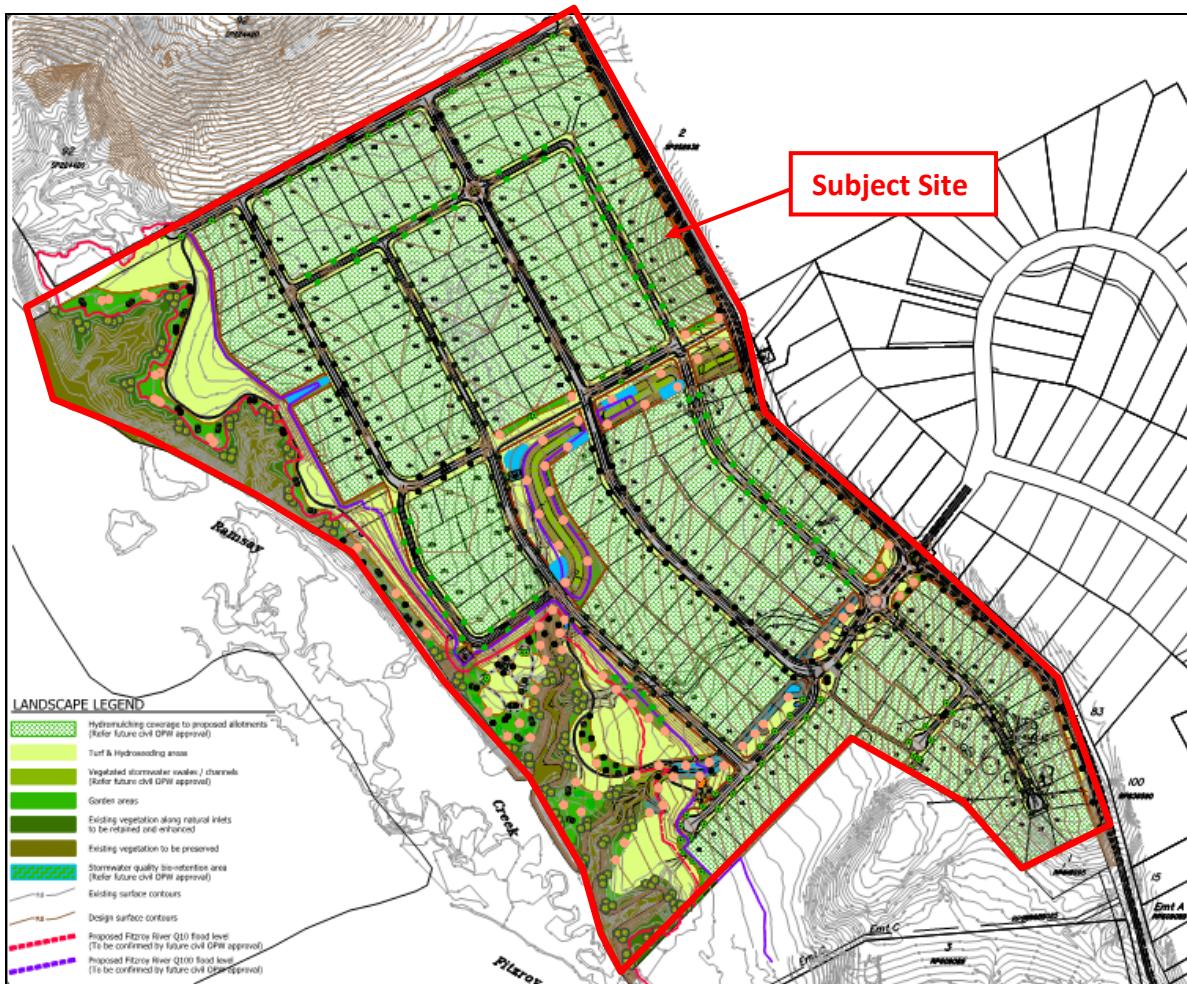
Proposed Layout (modified from Contour Consulting Staging Plan)
